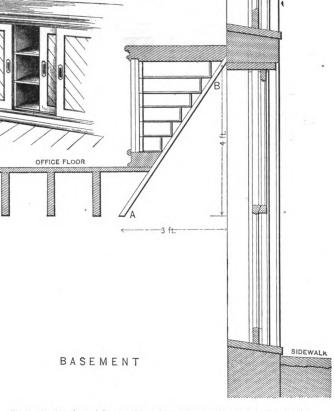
Section through Basement and Office, Showing Lighting Arrangement.
